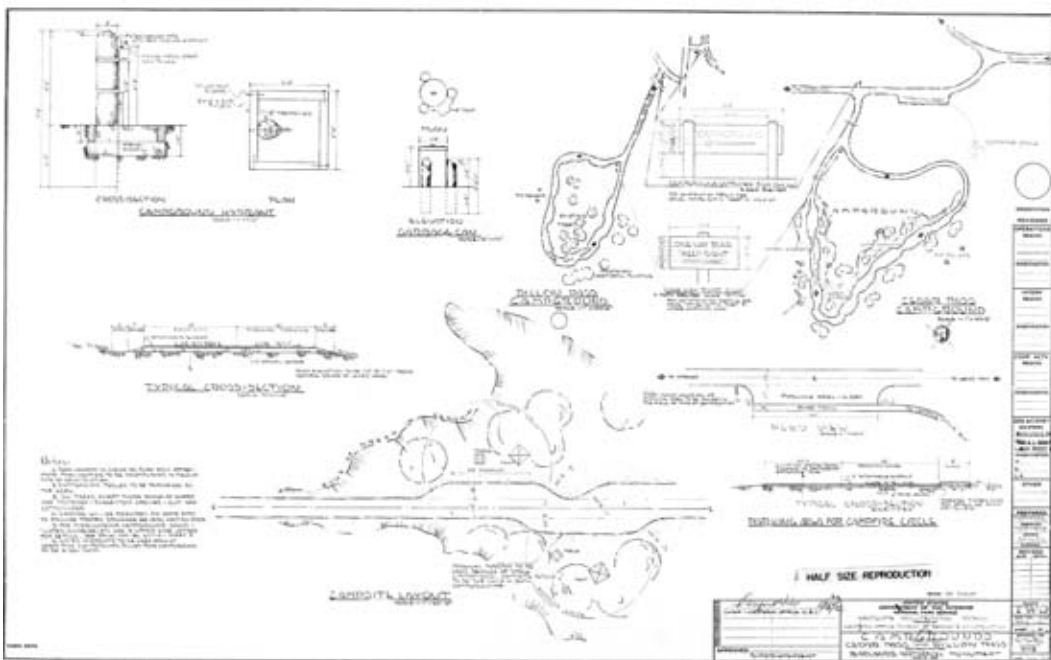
Mission 66 campground plan. (DSC-3113)
